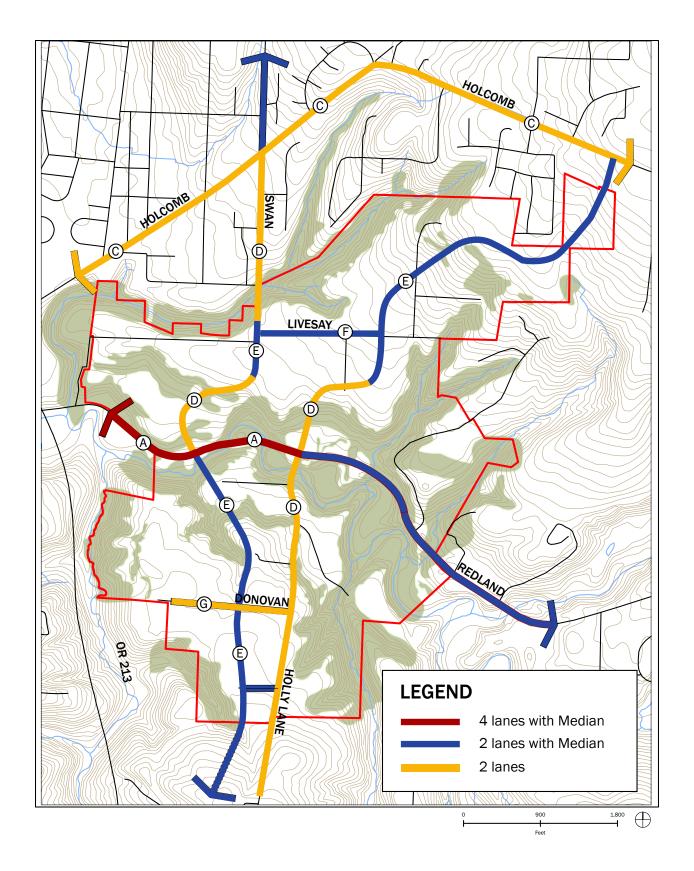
Concept Plan Street Sizing Map with Proposed Cross Section Designations
